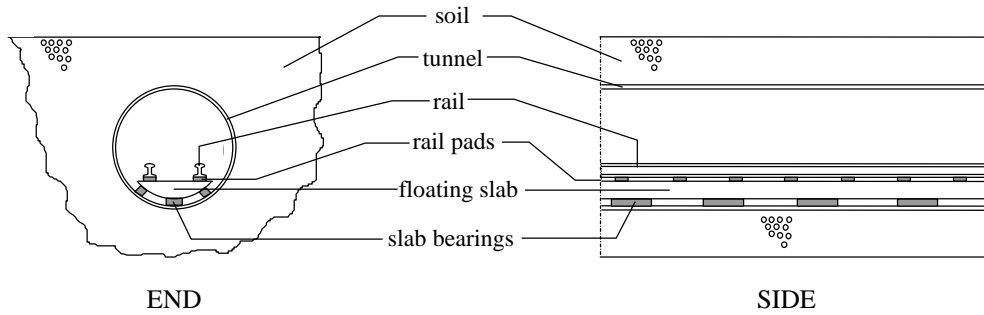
Underground railway layout showing the components of floating-slab track.
